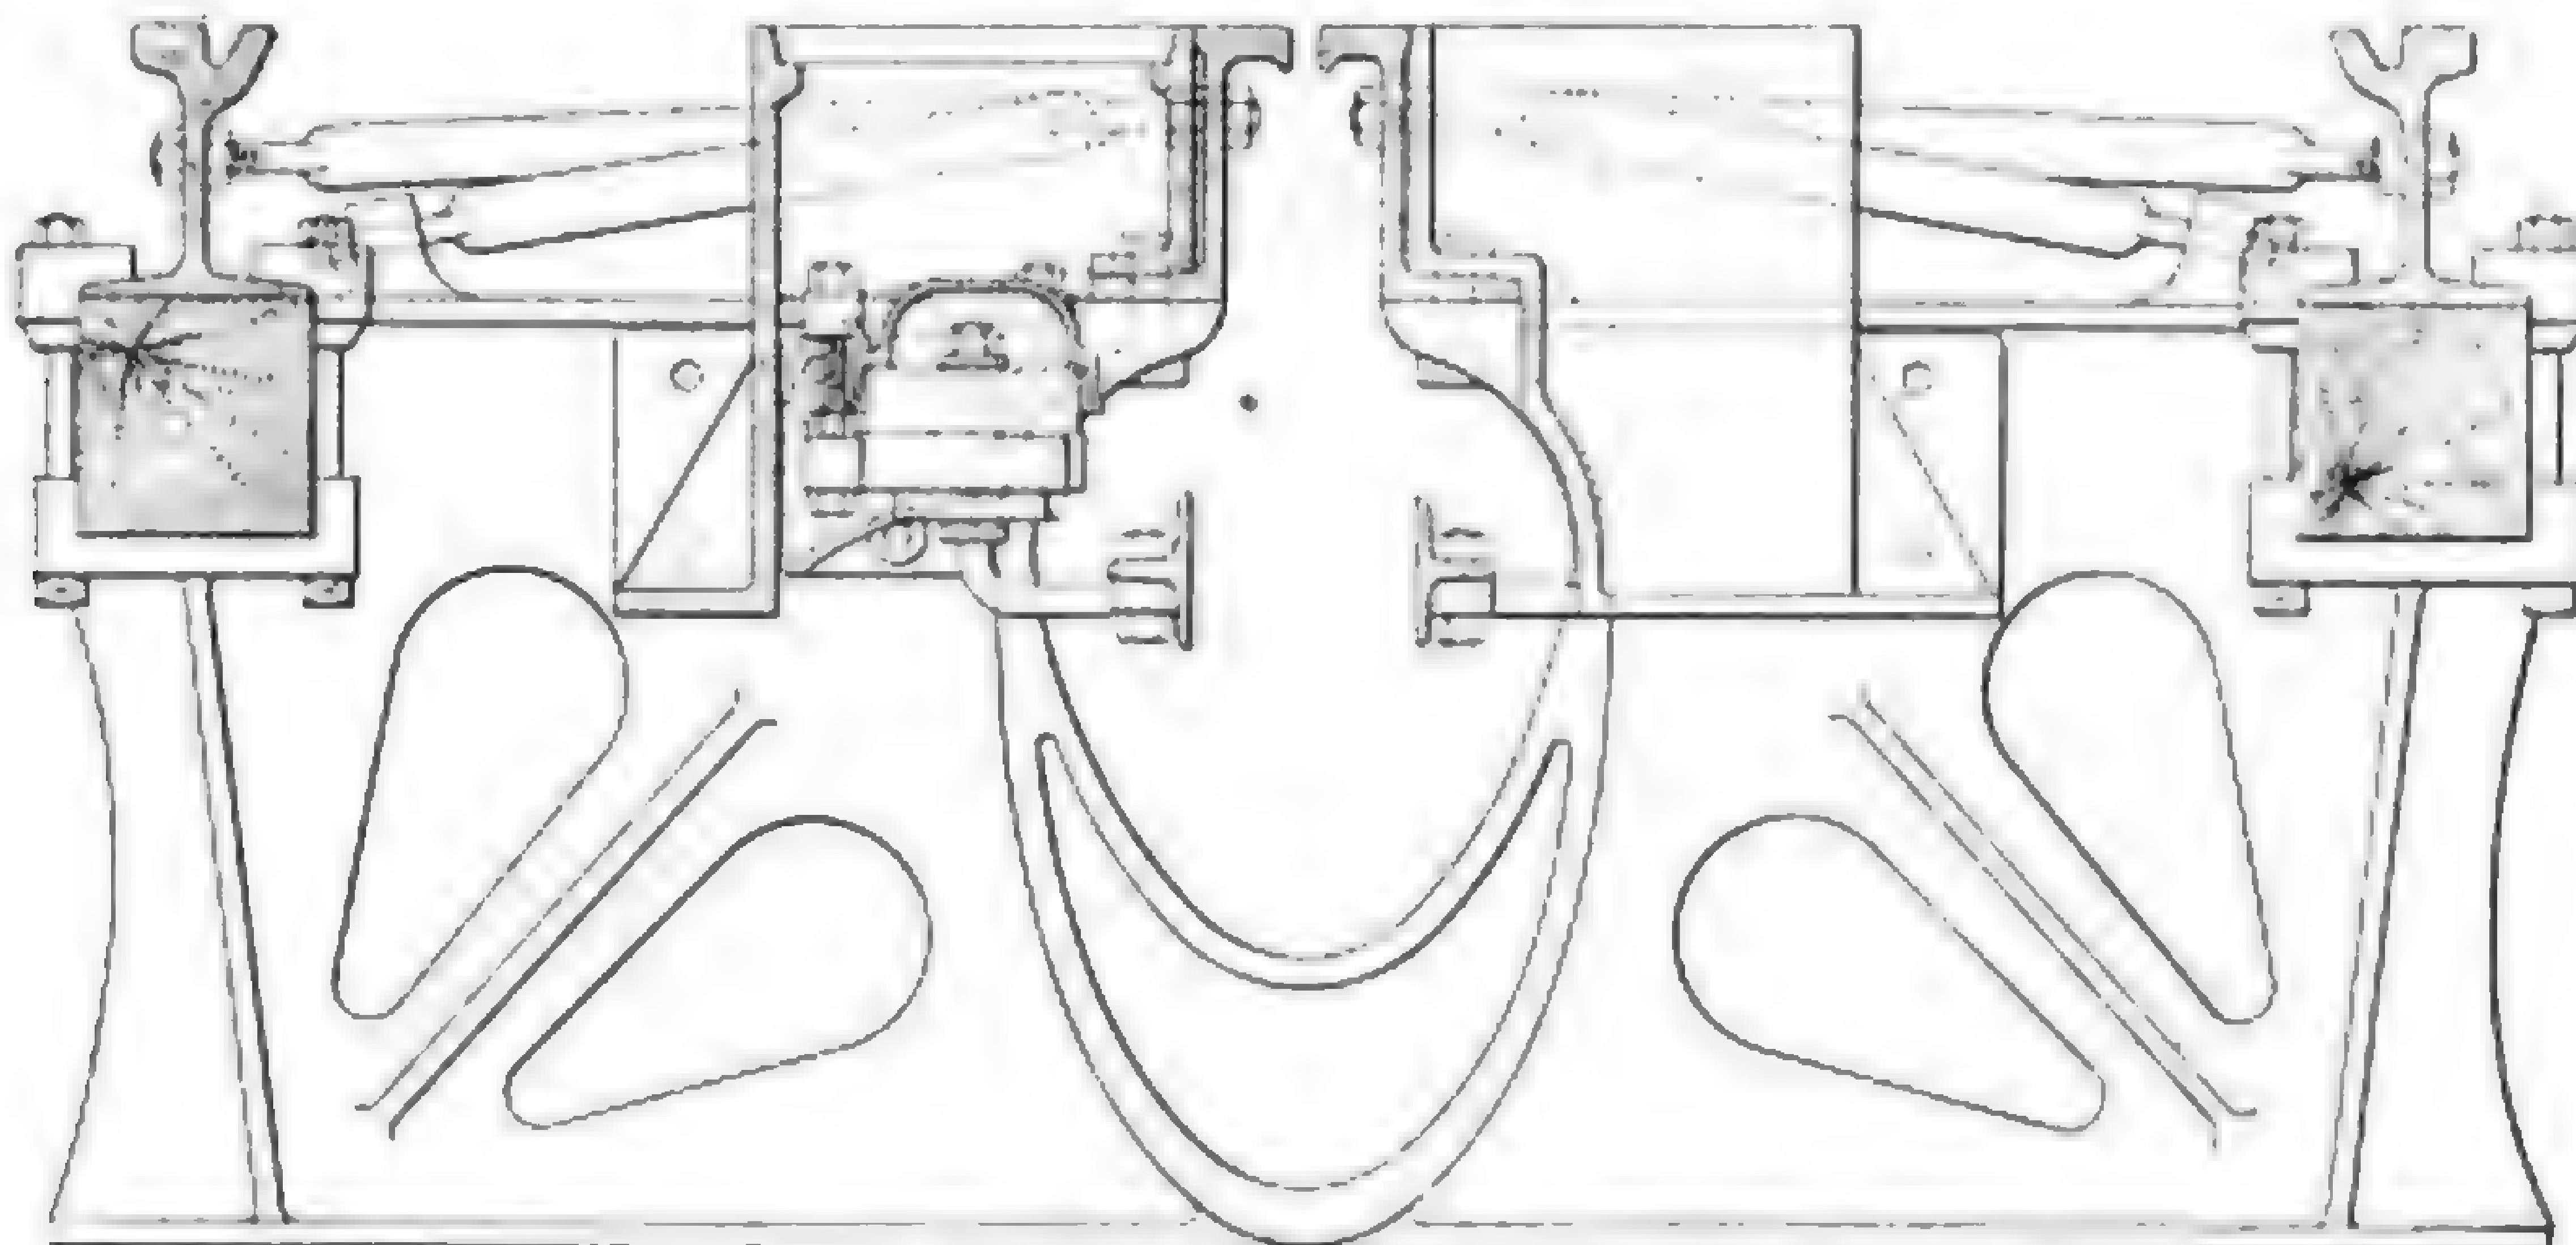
SECTION OF WESTINGHOUSE CONDUIT.
